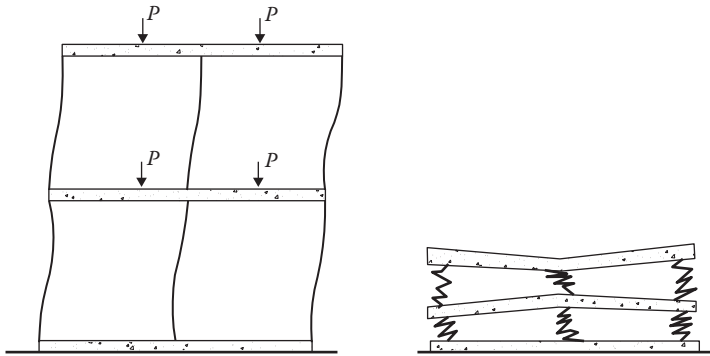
Breaking up of poorly detailed joints may result in failure of columns.
